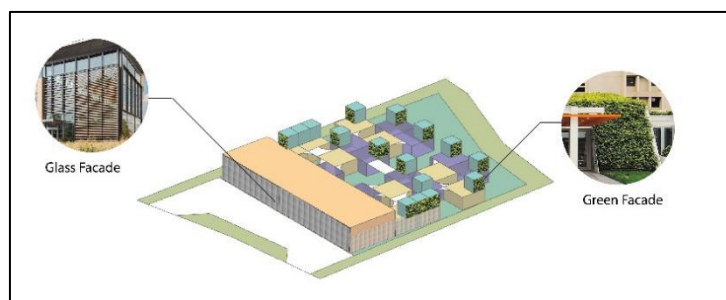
Façade arrangement strategy with *glass façade* and *green façade
